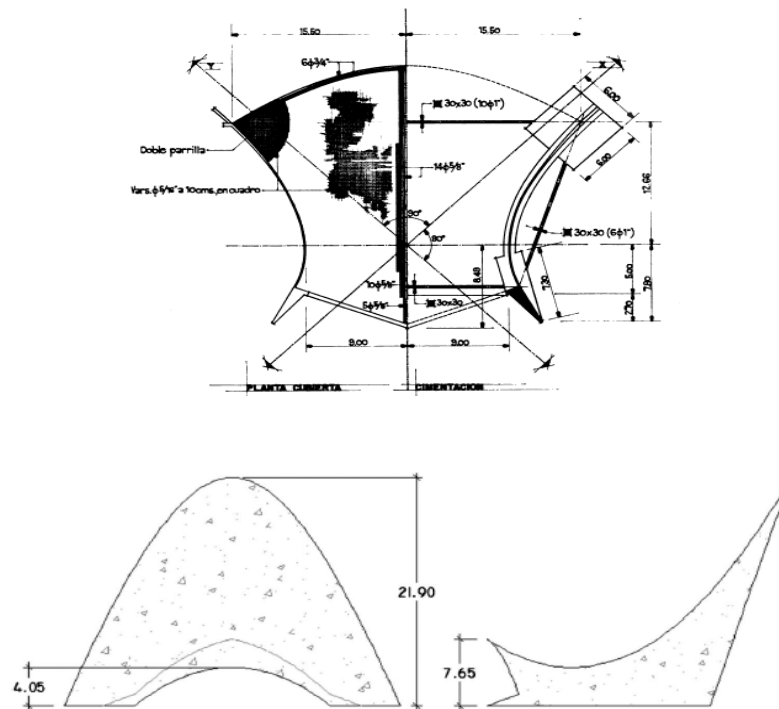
Palmira Chapel Ground - Roof plan (left), front elevation (center) and lateral elevation (right).
